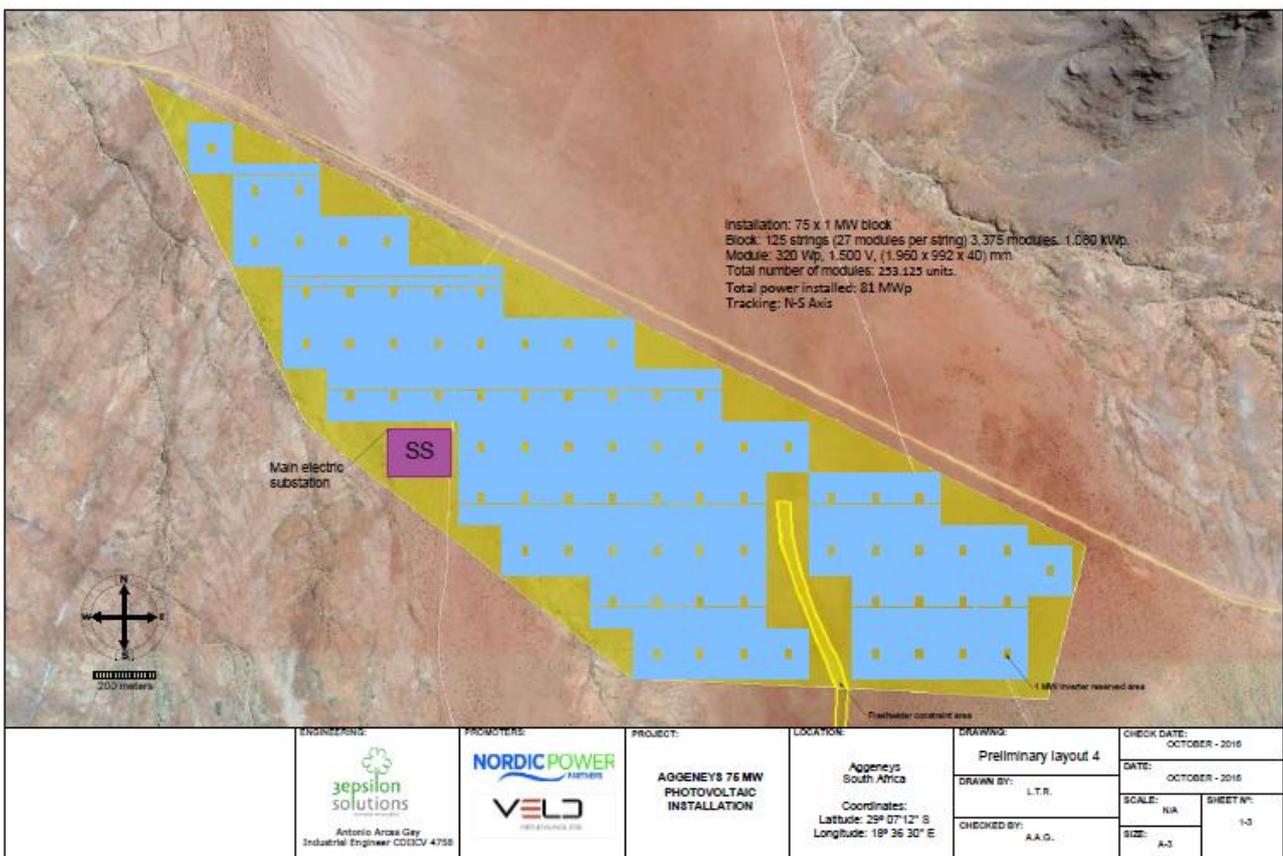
Preliminary layout plan of the proposed facility on the Naroep (original north) site.
